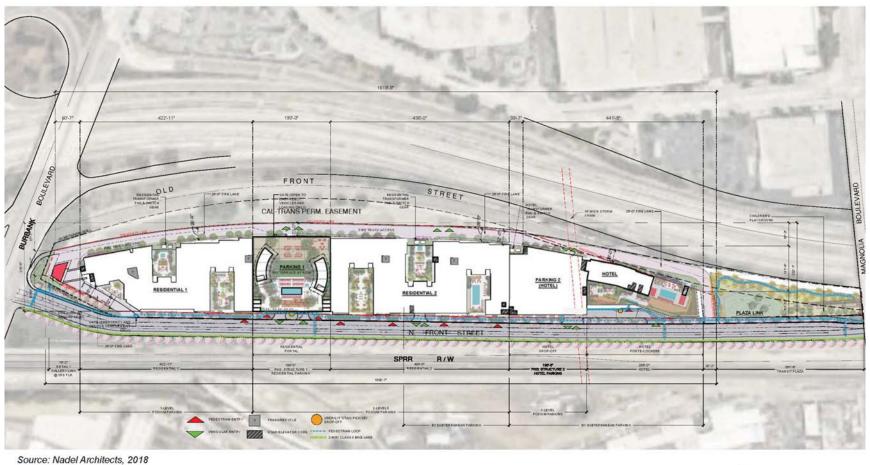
Conceptual Site Rendering - Aerial View of West Elevation
